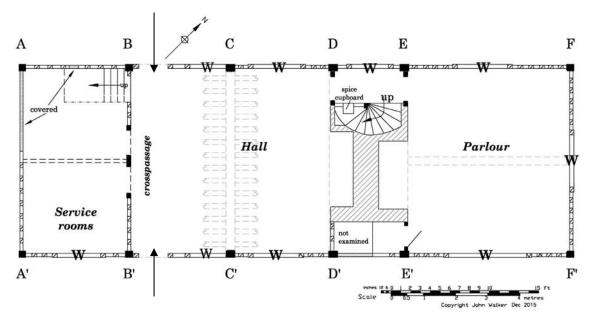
Ground plan of Thurstons, Rendham, Suffolk an example of the typical layout of a north Suffolk 16th century post-medieval farmhouse
